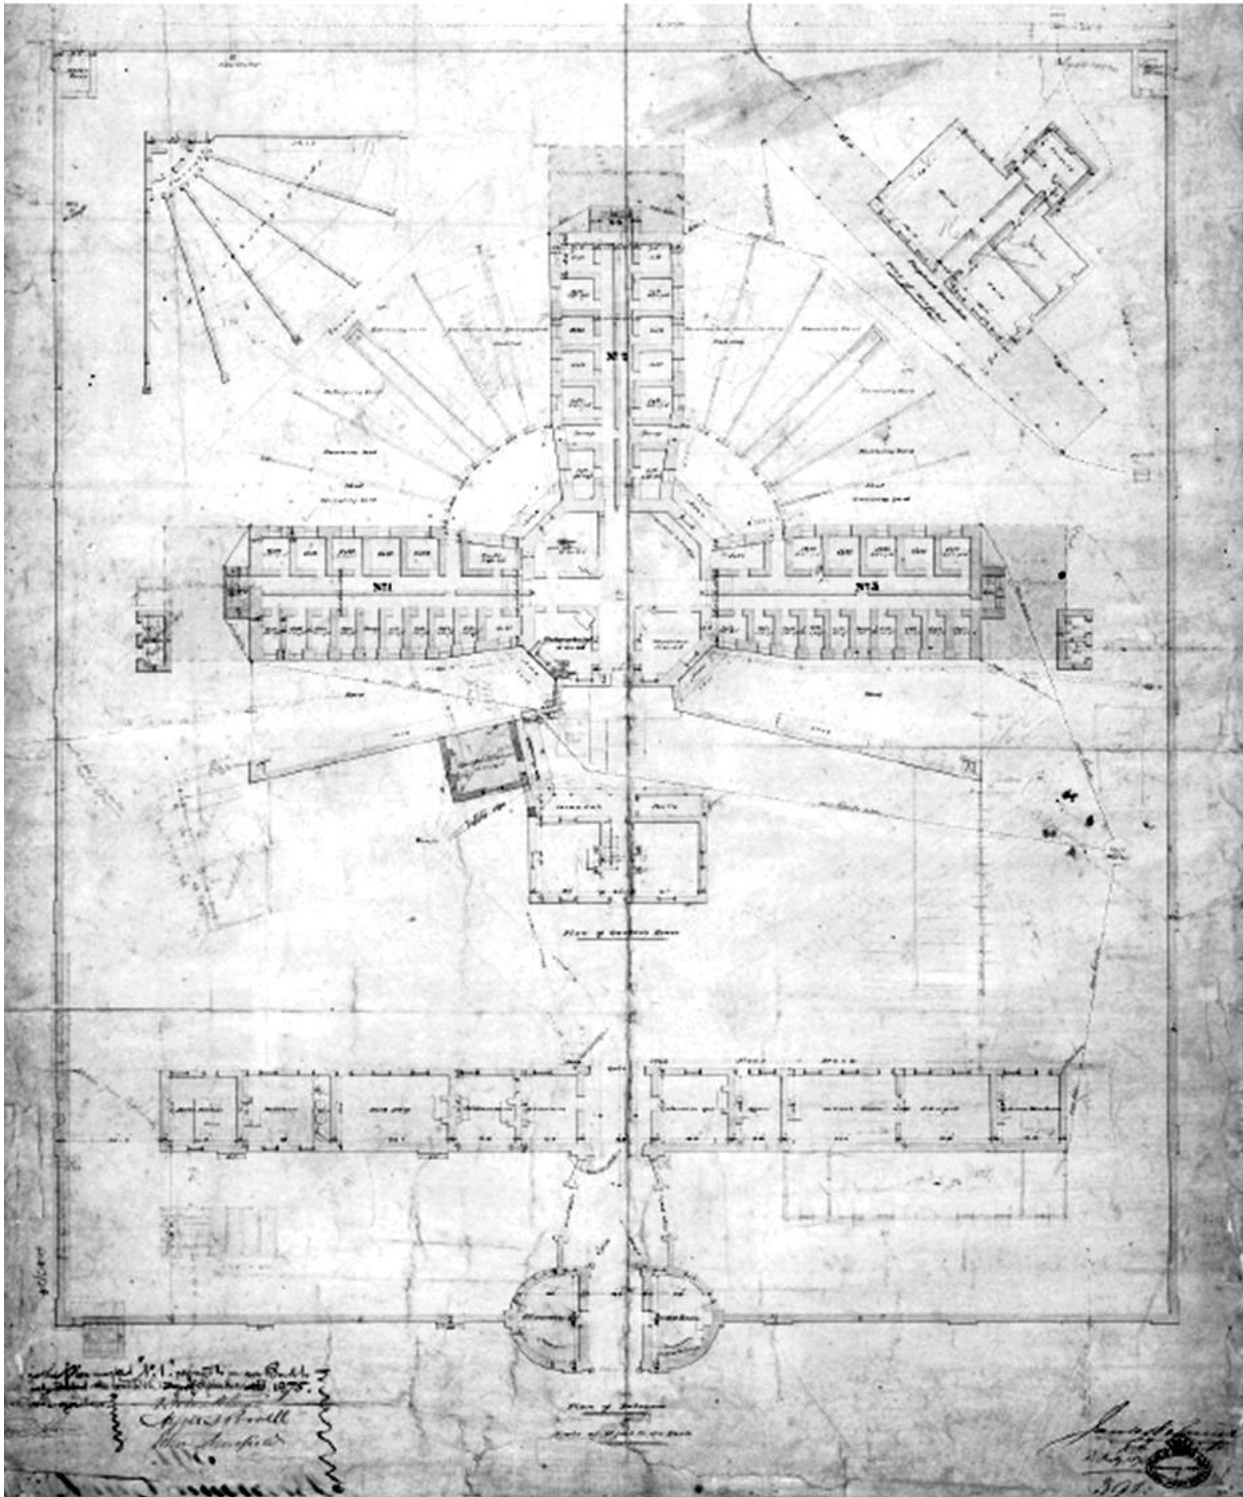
Detail architectural plan ('Plan of Berrima Gaol'), signed by James Barnet on 2 July 1875, showing the new gaol entrance at the bottom centre (1866), and a long wing containing the old entrance and associated buildings (all constructed 1839). Located towards the top of the image is the gaoler's residence (1863), proposed kitchen (coloured red and yellow), and the central building and its associated cell wings (ground floor: 1839; first floor: 1863), along with detached toilets, and airing and exercise yards (1839, further subdivided 1863-66). At the top left-hand corner of the plan outlines the hospital and watch tower with an additional watch tower and exercise yard at top left (all constructed 1863-66).
